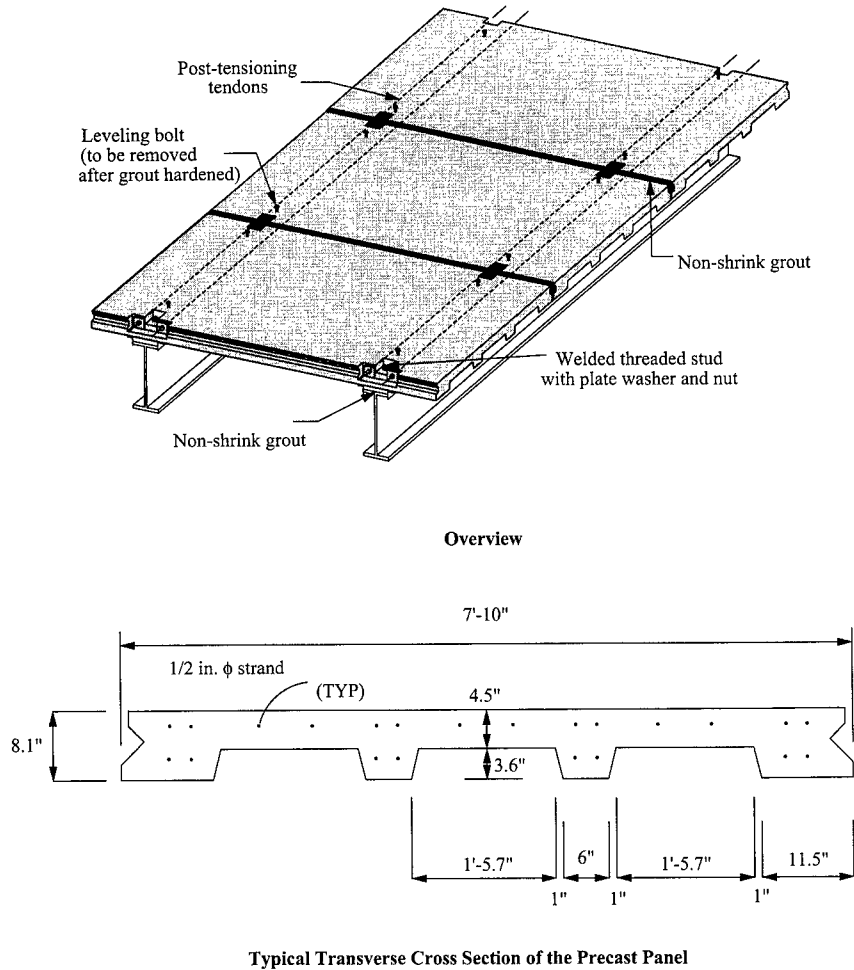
Full-depth precast prestressed concrete bridge deck system.
